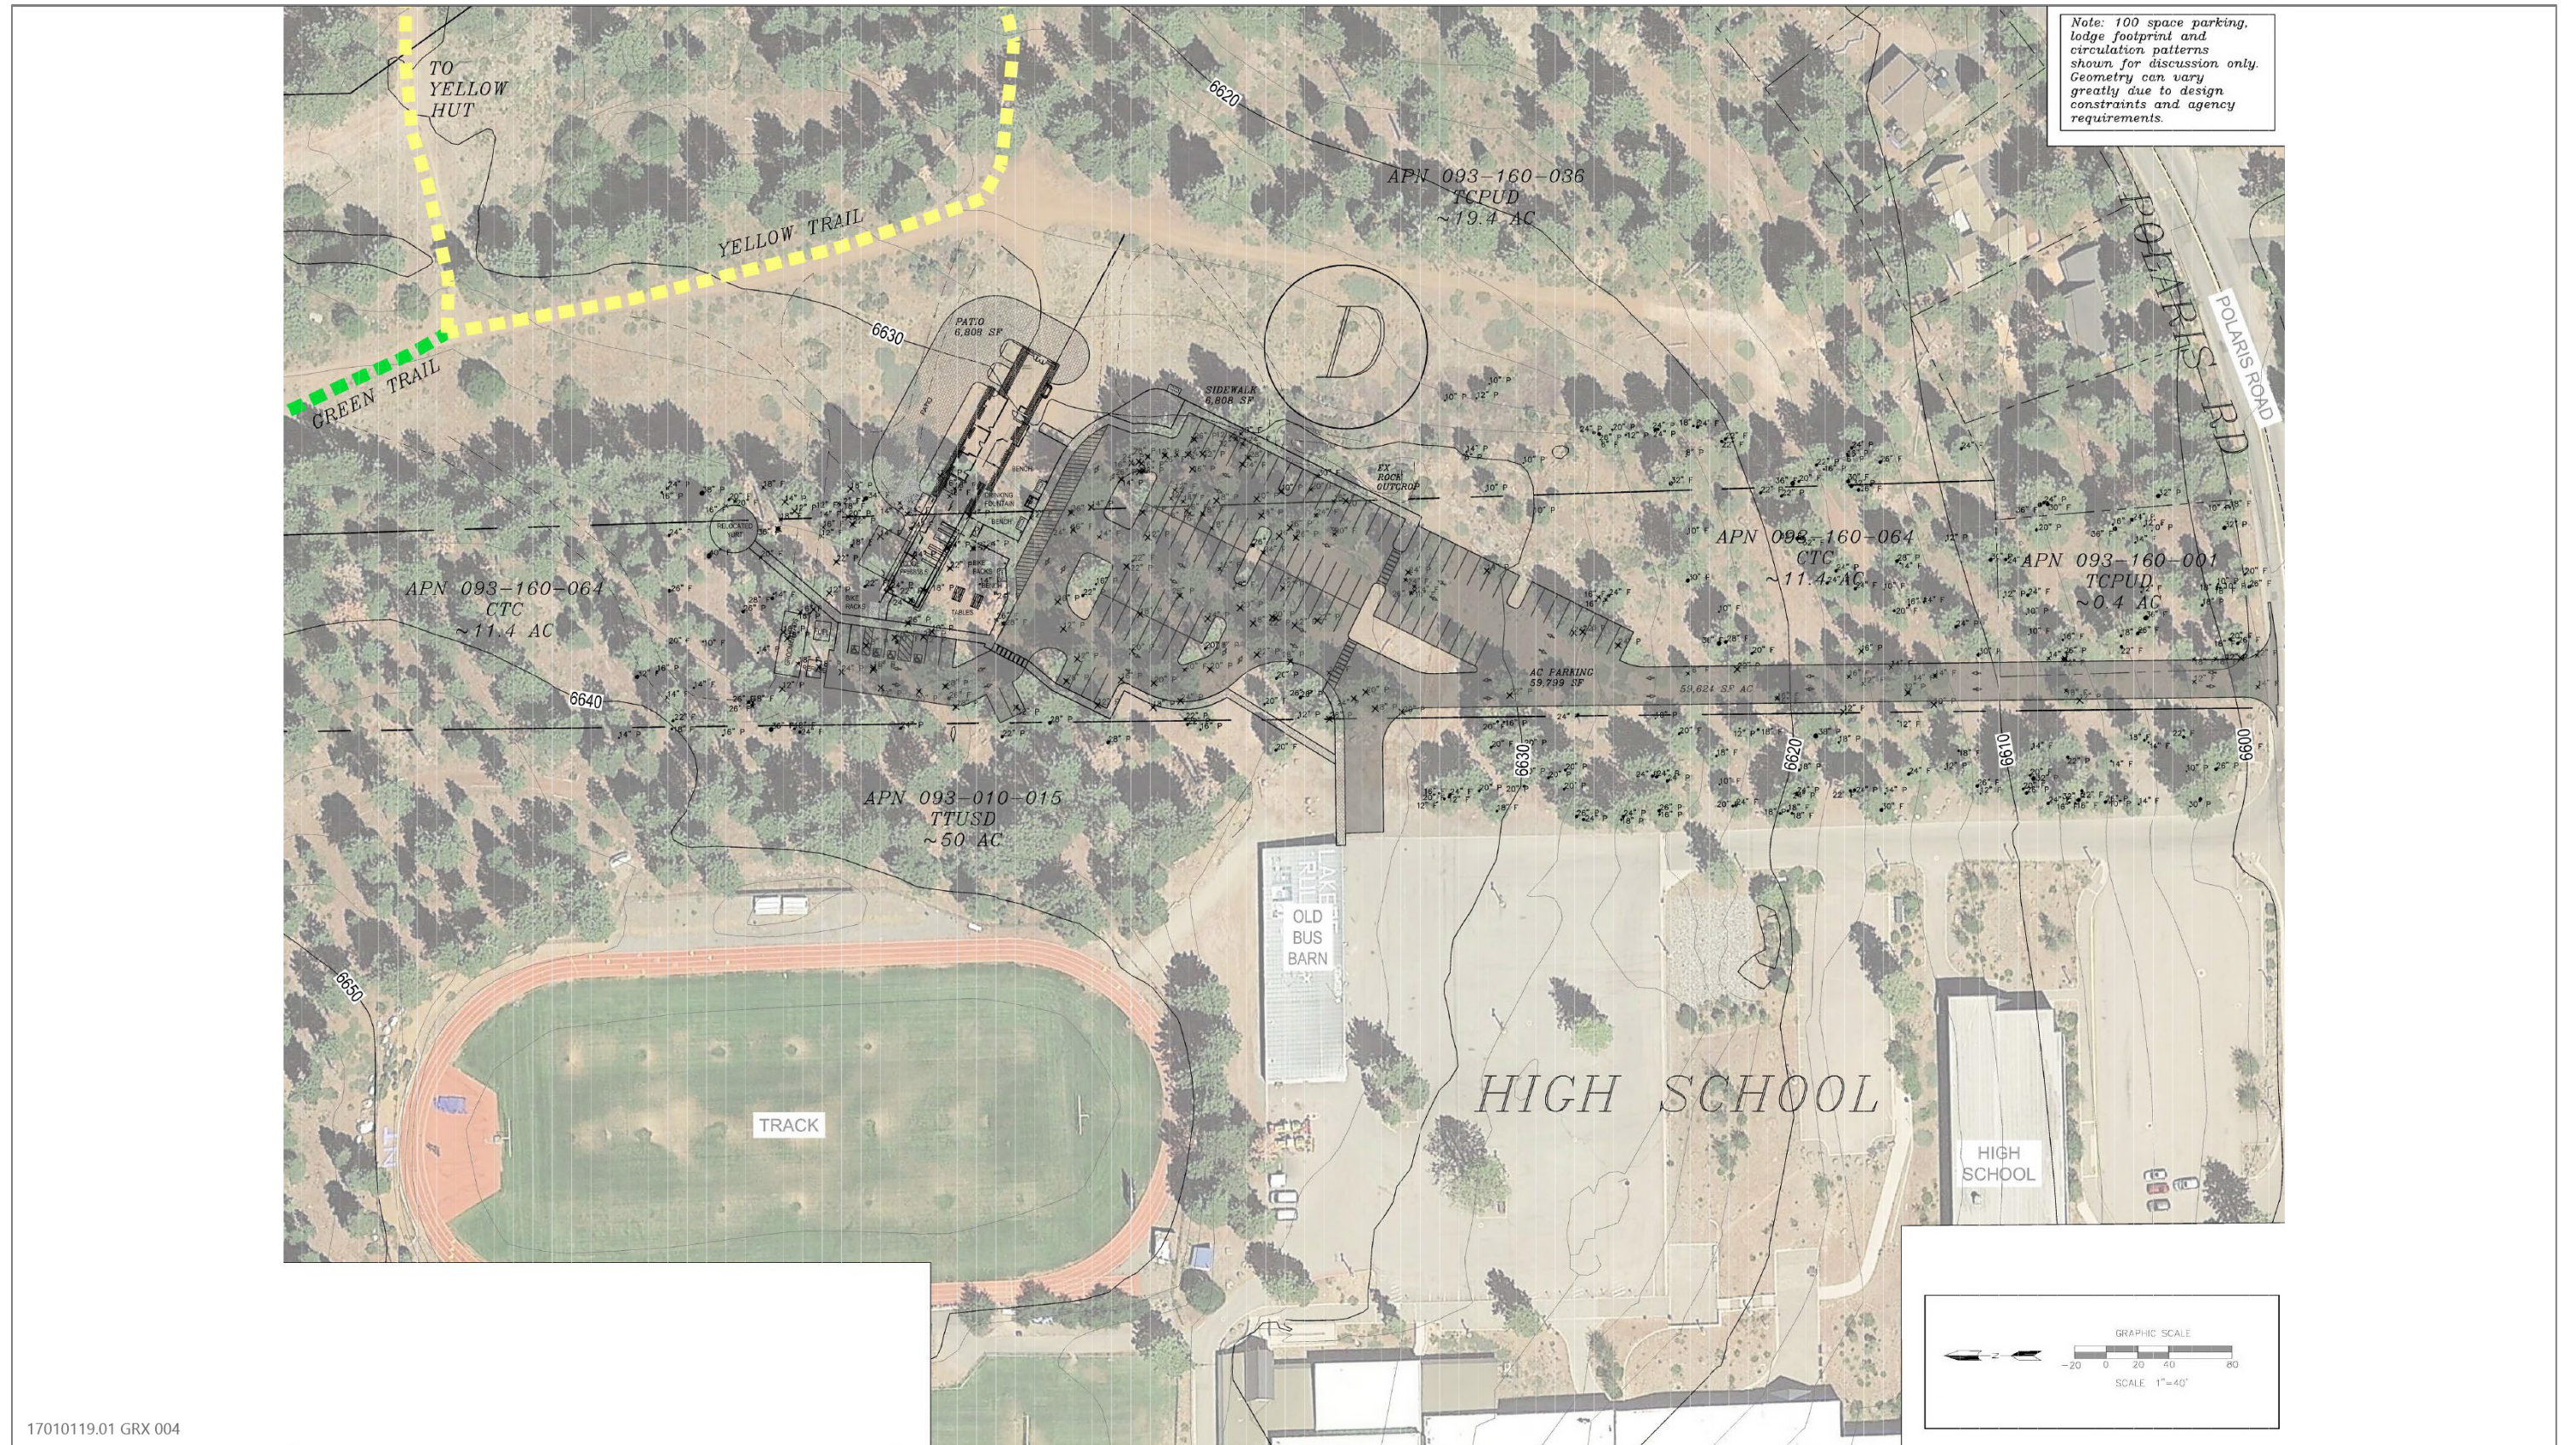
Schilling Lodge Site Plan – Proposed Project
